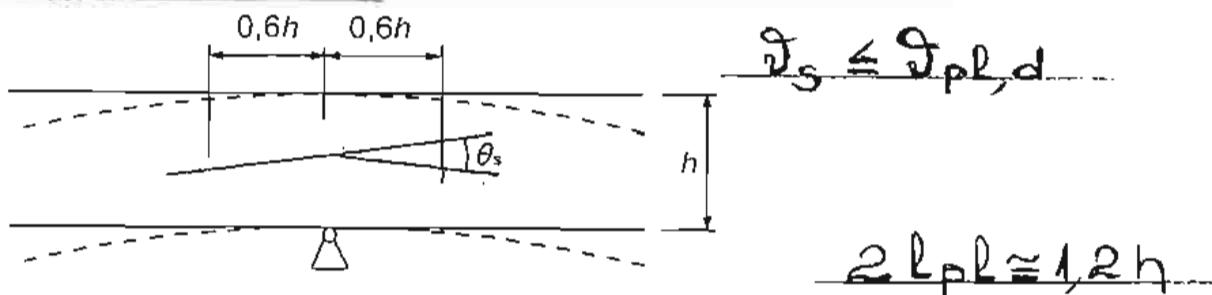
Plastic rotation θ_s of reinforced concrete sections for continuous beams and continuous one way spanning slabs.
